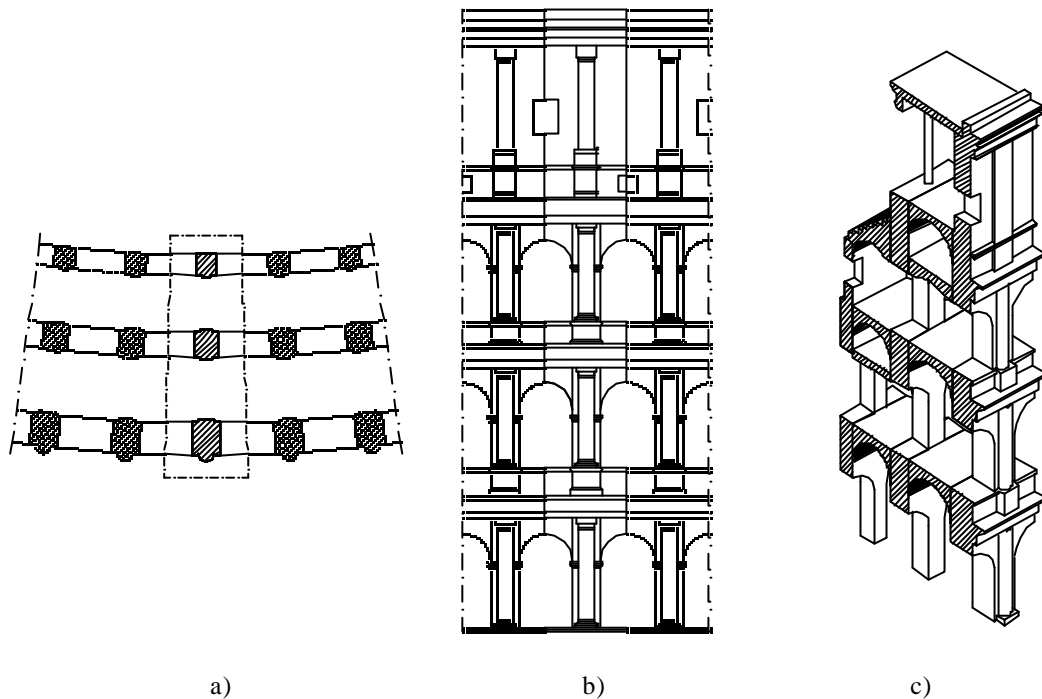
Structural module of the external wall: a) plan; b) view; c) axonometry
